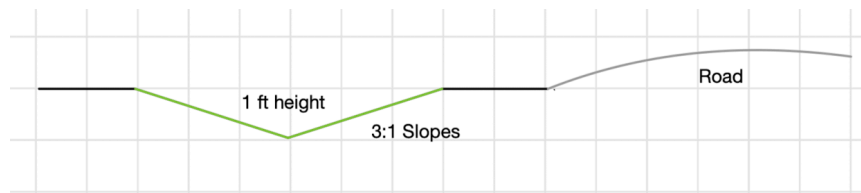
Roadside conveyance specifications and vegetated swale cross-section
